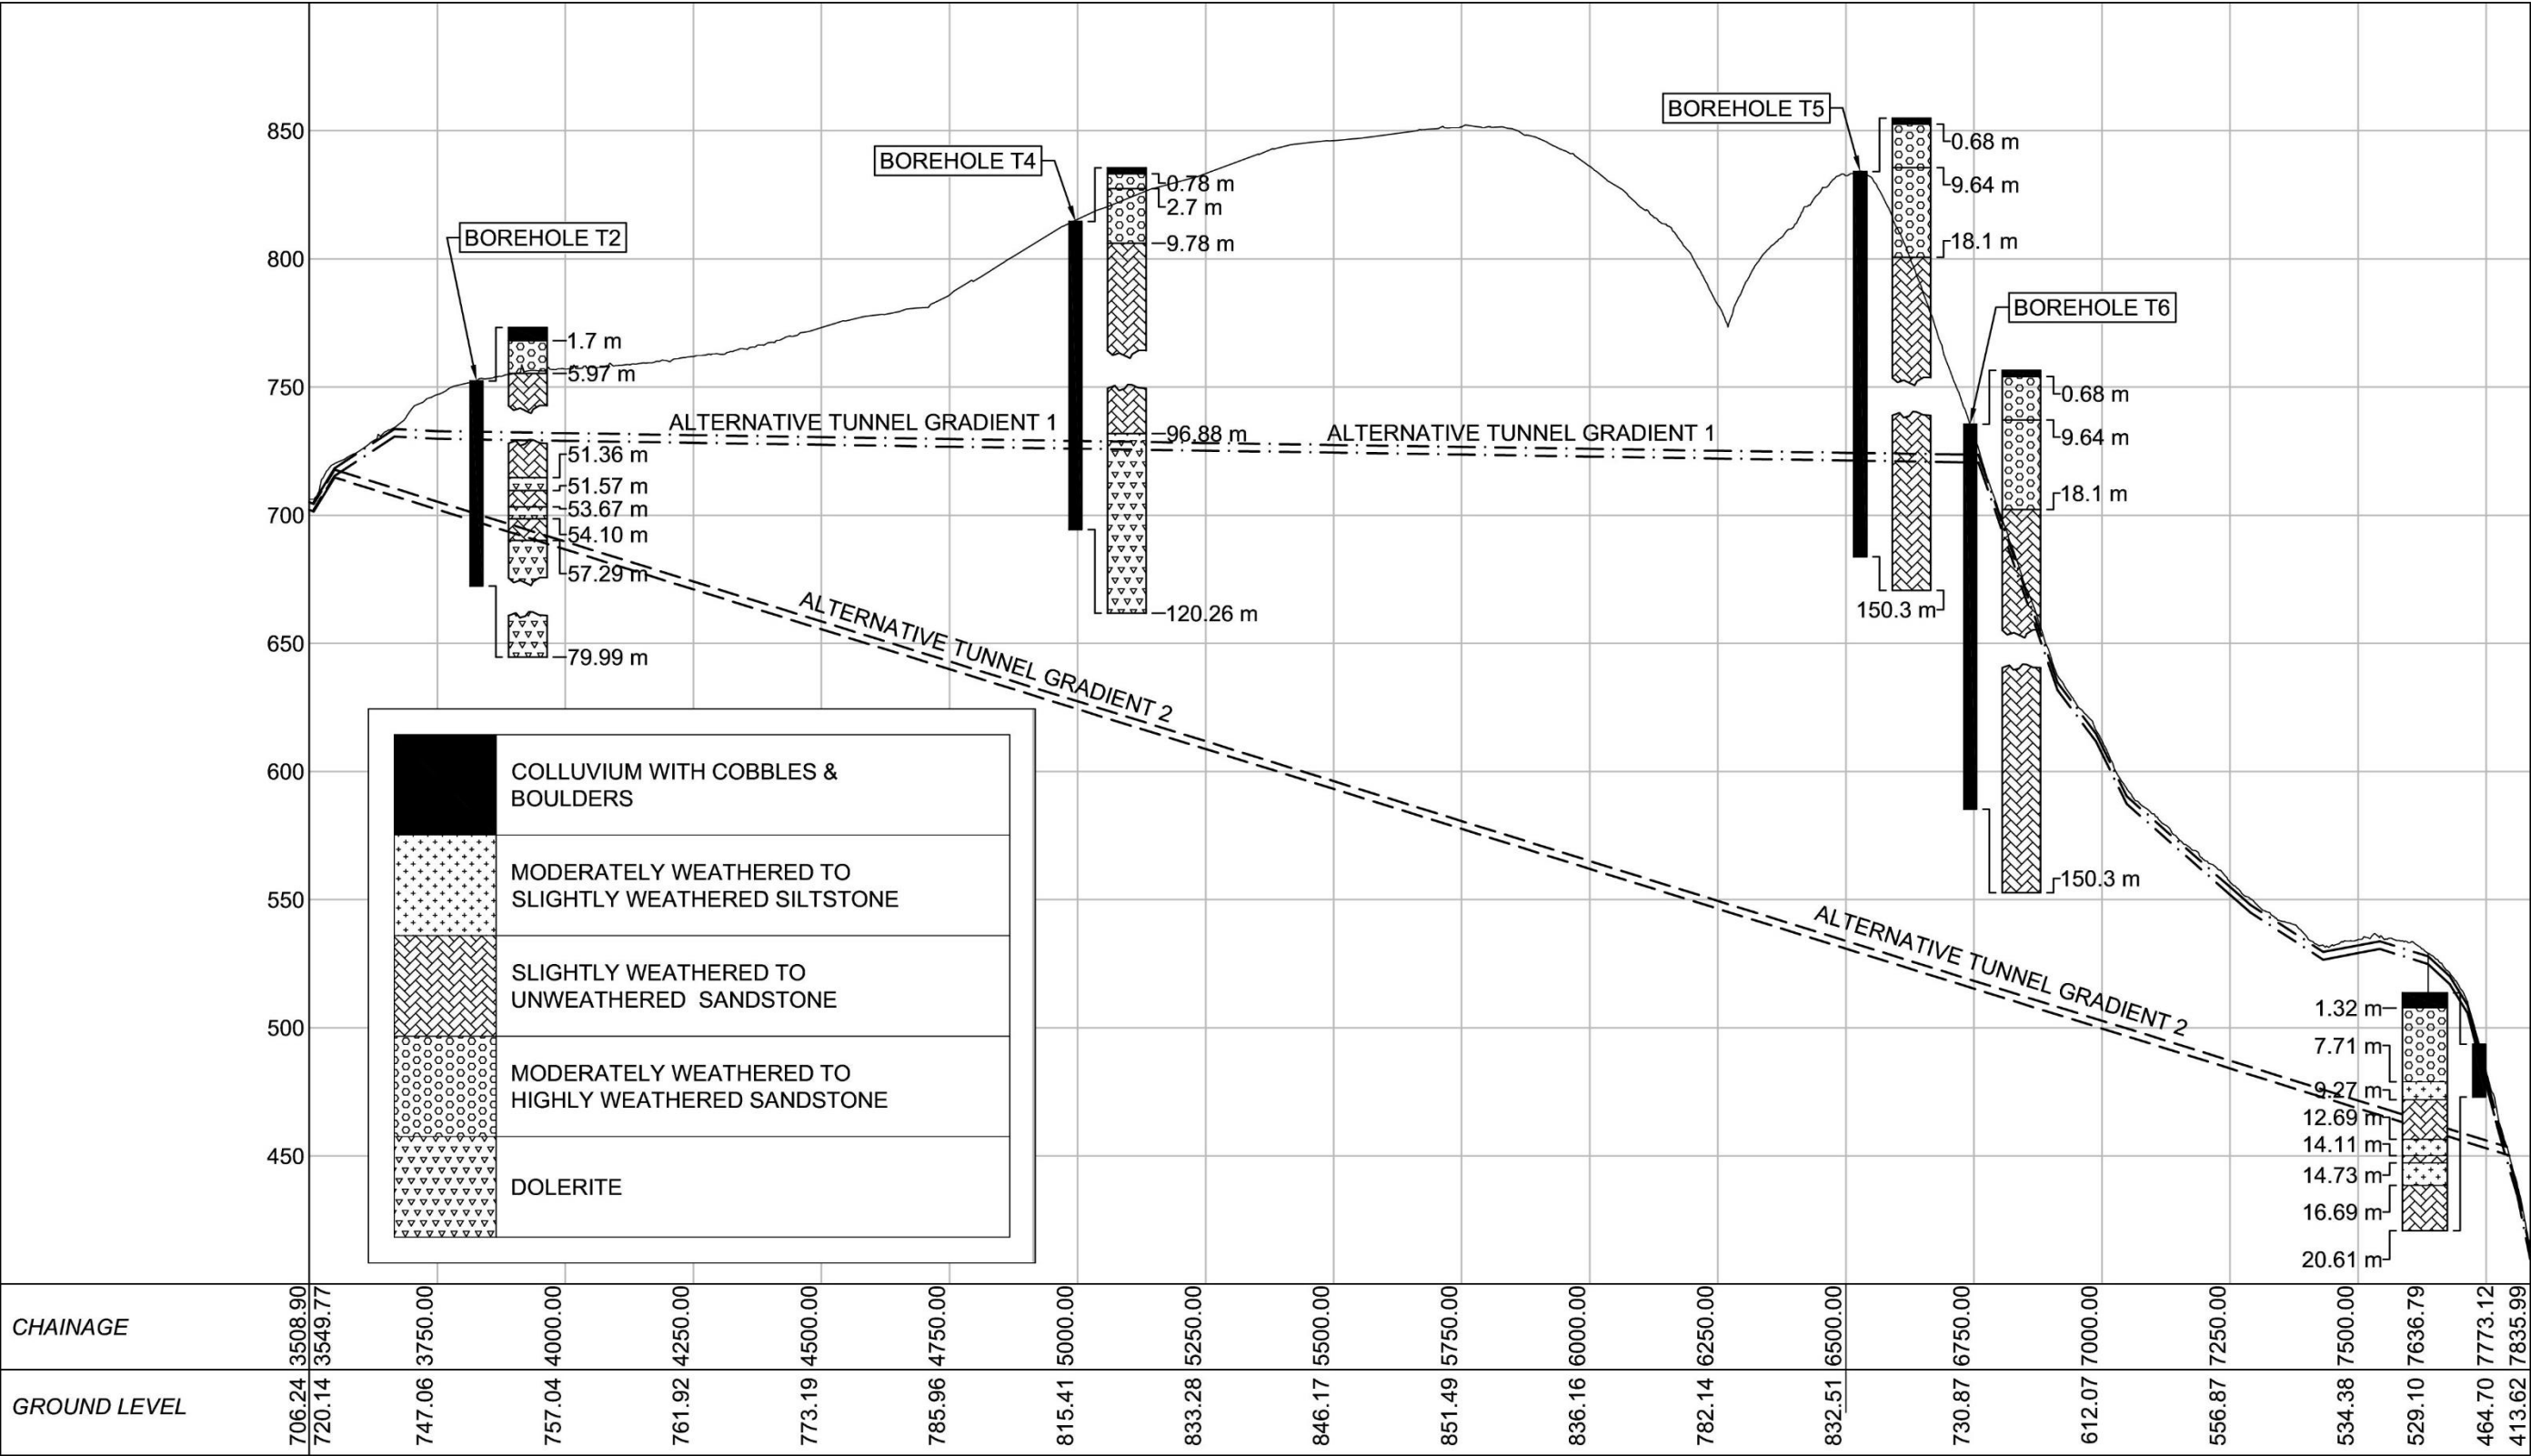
Boreholes Drilled along Tunnel Alignment
